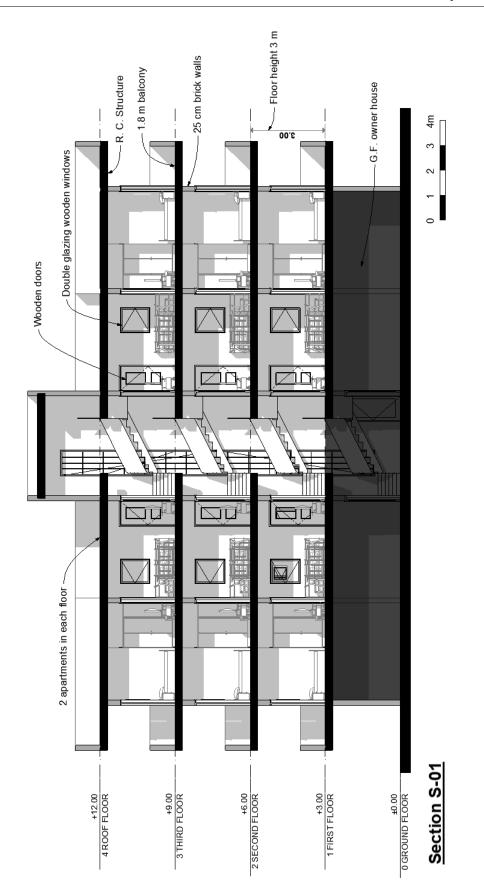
Typical section of apartment building testing model and the most common features are highlighted
